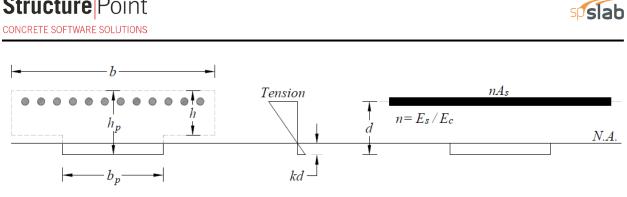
Cracked Transformed Section (Negative Moment Section)
